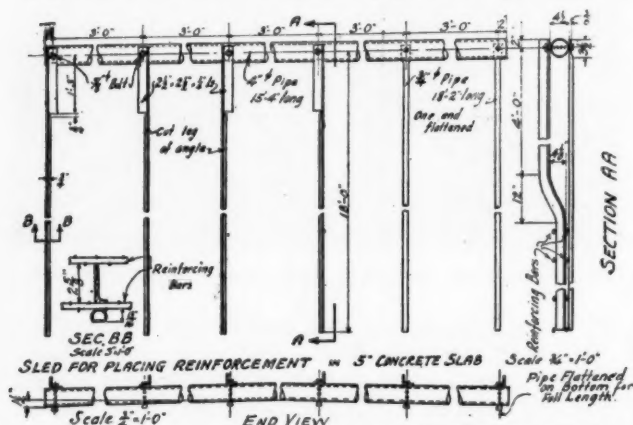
SLED FOR PLACING REINFORCEMENT IN CONCRETE PAVEMENT
